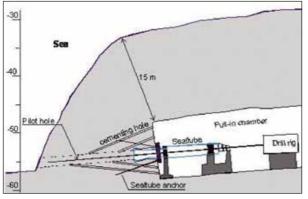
Layout of the piercing with the small pilot hole (made by directional drilling). The cementing holes were used for filling cement grout around the pipeline in the piercing hole after pull-in. (Palmstrøm, Skogheim 1999)
